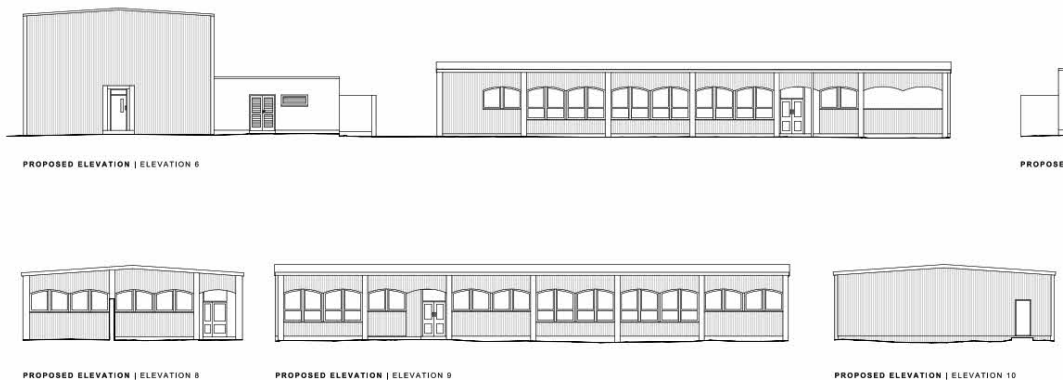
Proposed elevations of assessed building 2 - drawing 1600529.2.20 Drawn by AC by Marrons Planning
